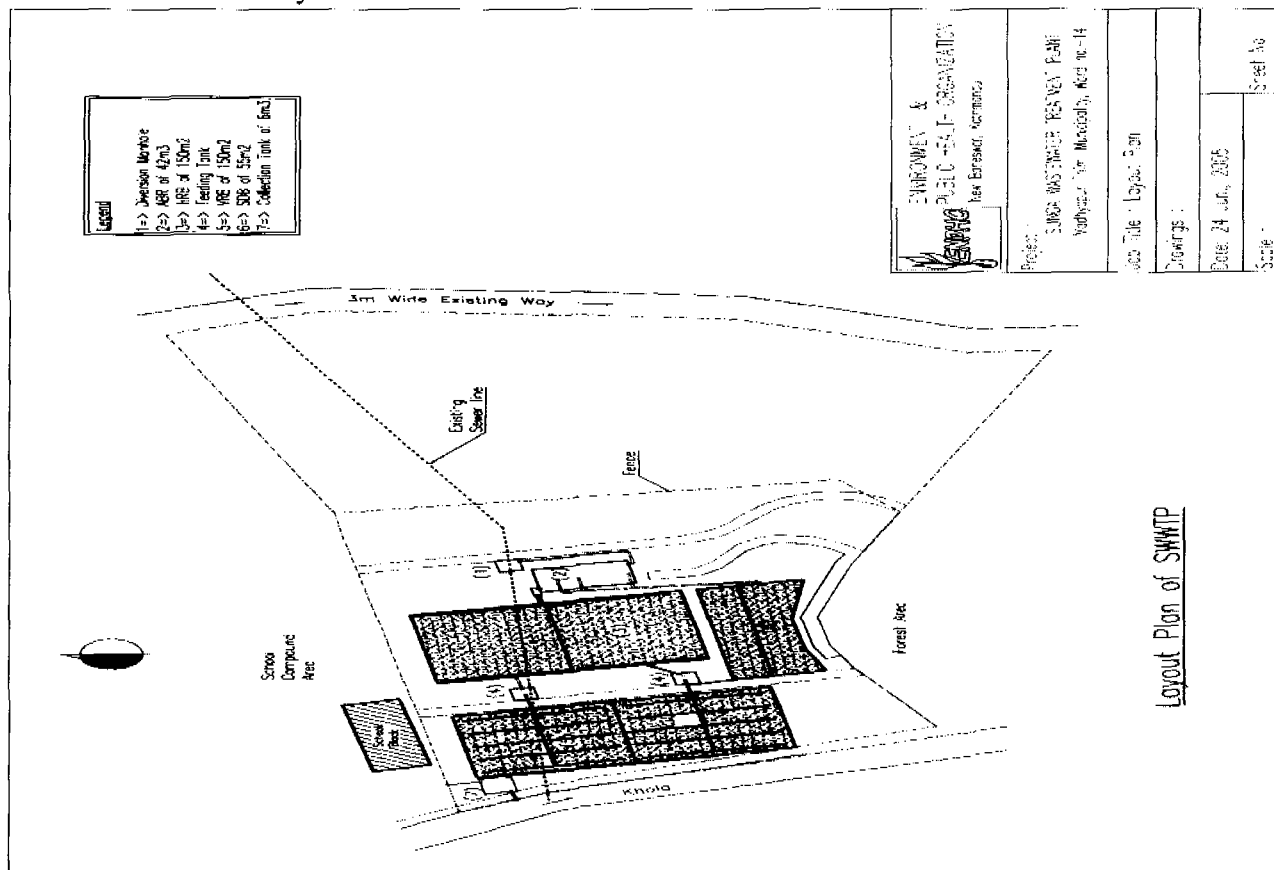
Layout of Sunga Wastewater Treatment Plant
